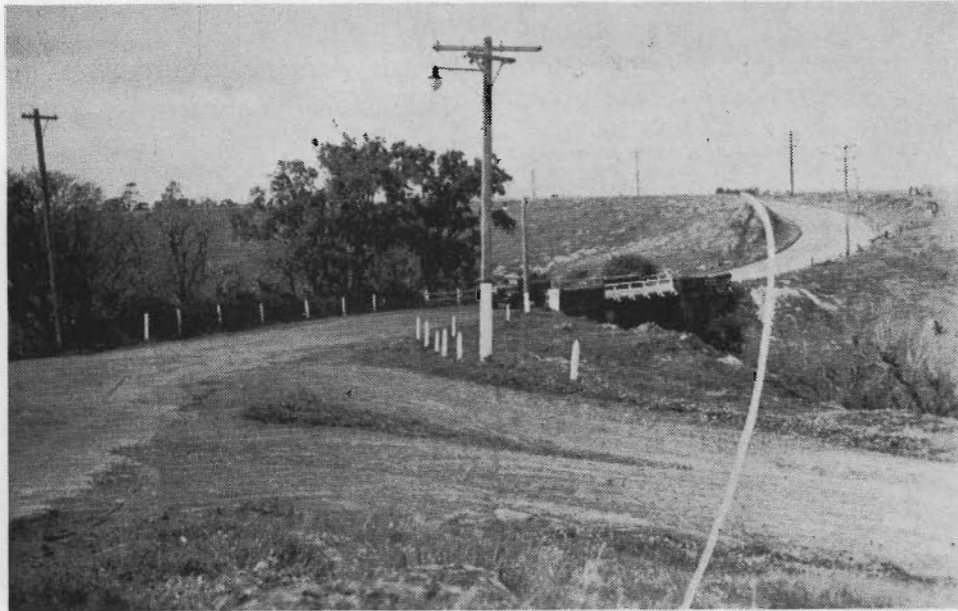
Showing bridge over Darebin Creek and proposed alignment of new structure.
